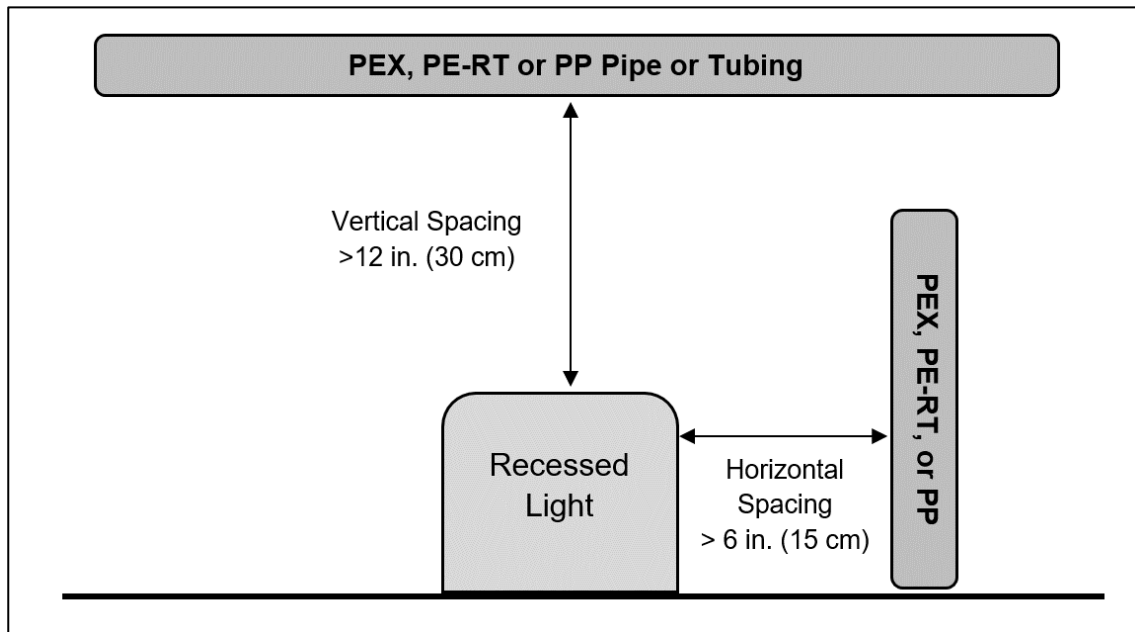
Protecting PEX, PE-RT or PP pipe or tubing against excessive air temperature with default minimum spacing
